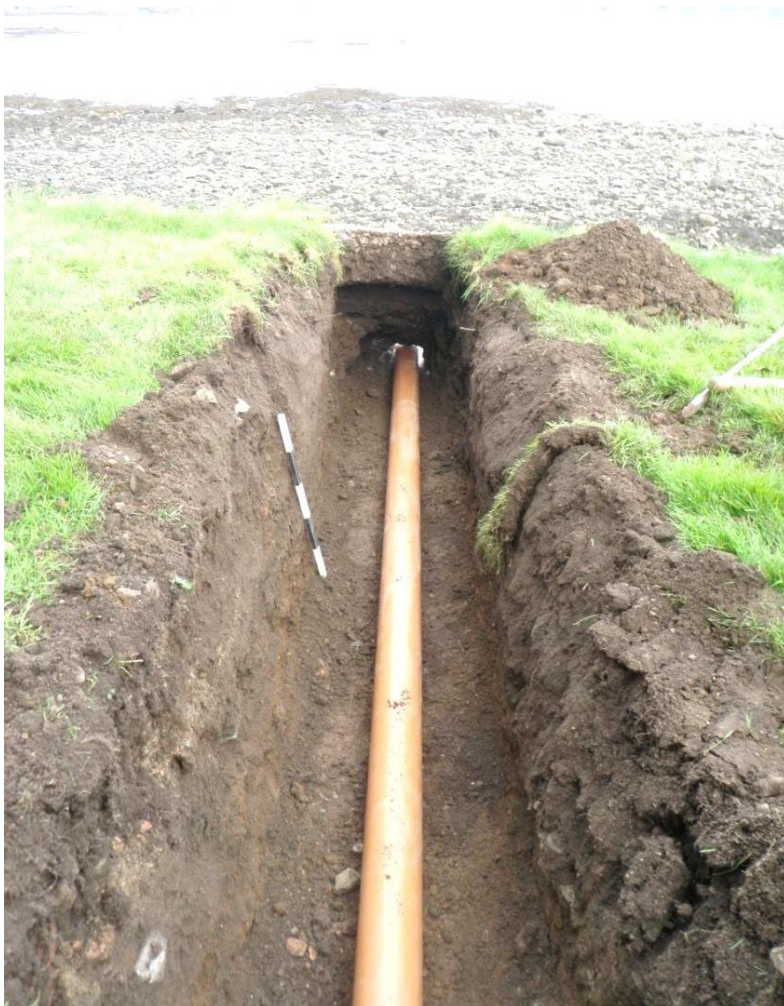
Looking north along the northern end of trench H, showing lower layer (126), etc and breached sea wall with new pipe feeding through it.
